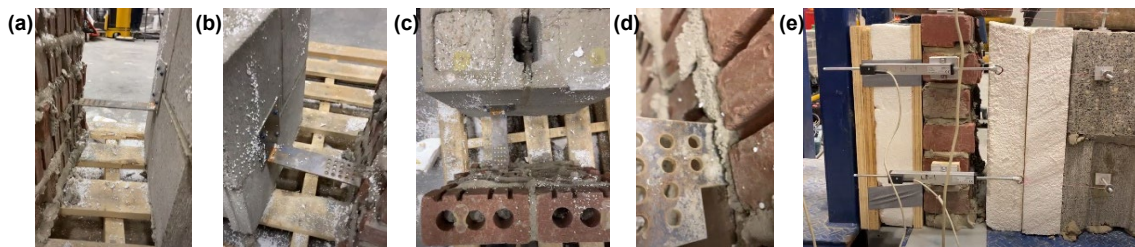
C-PH.CL-1 after testing of (a) side view, (b) alternative side view, (c) top view, (d) clay brick veneer mortar joint condition, (e) specimen view during testing
